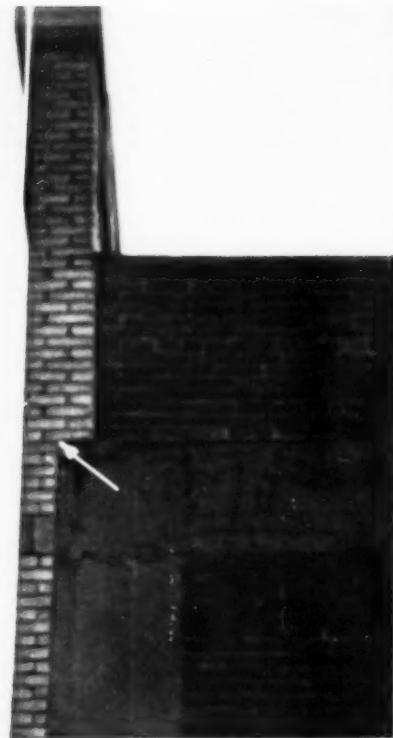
This parapet wall is two inches out of plumb at the top. Note the broken corner of the roof slab under arrow head. The roof slab was not insulated and at times gets damp from condensed moisture.
